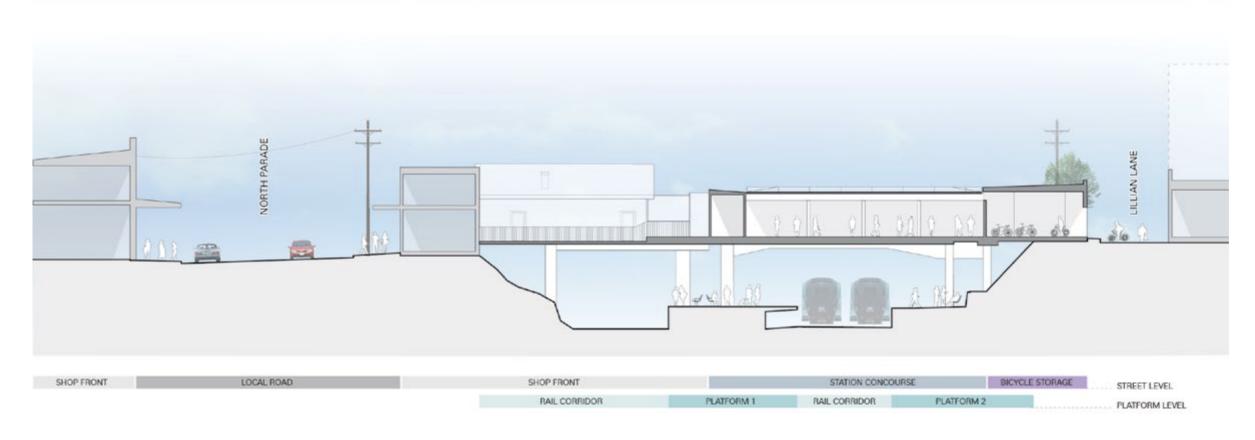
Section B Campsie - Short section through concourse and platforms
